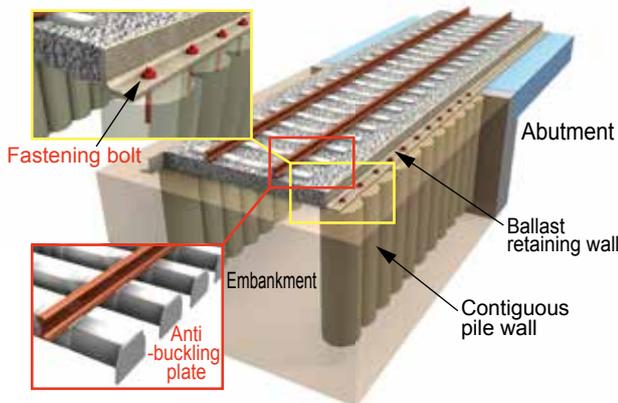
Integrated ballast retaining wall and contiguous pile wall
